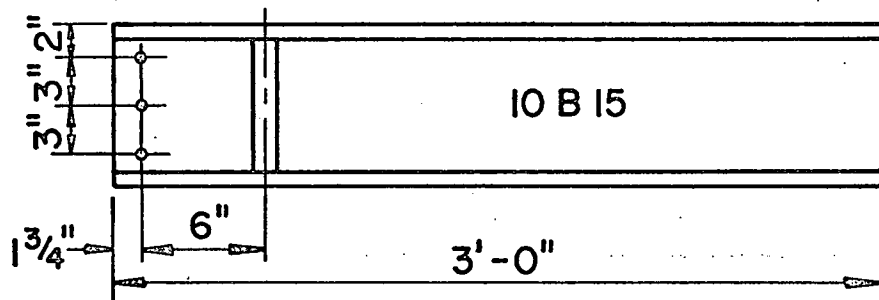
SIMPLE FRAMING CONNECTION DESIGN
